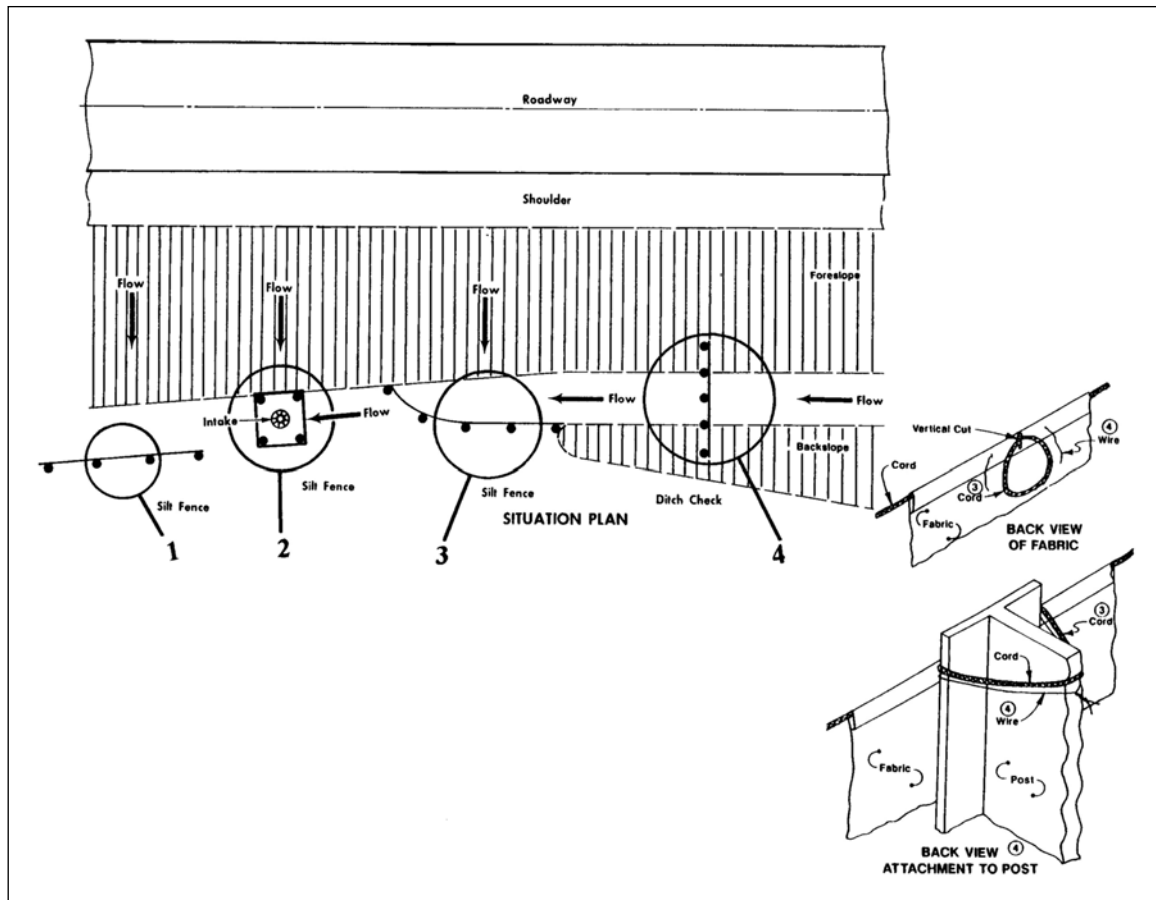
Silt fence situation plan (Source: Department of Civil, Construction, and Environmental Engineering, Iowa State University)
